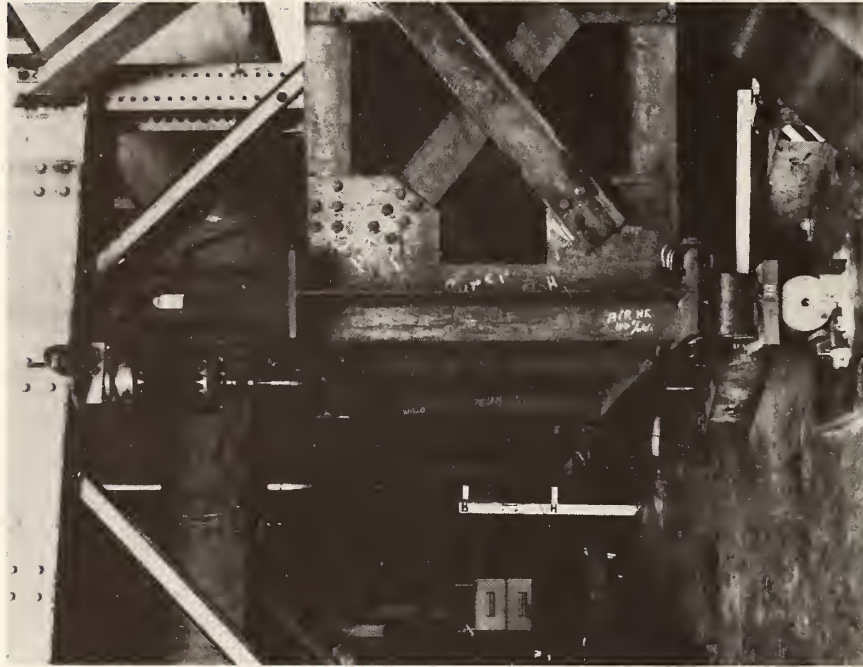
Assembly 1 on Dynamic Test Bed - Jack Position 1
